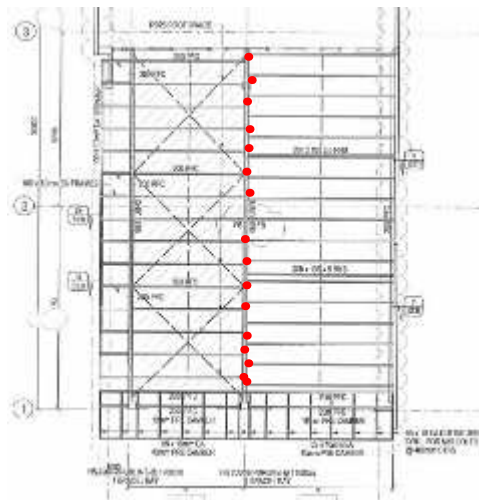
Part Plan of roof bracing over Civil Defence headquarters offices
